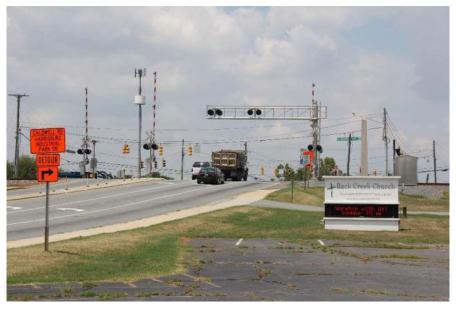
Existing At-Grade Crossing of Back Creek Church Road
